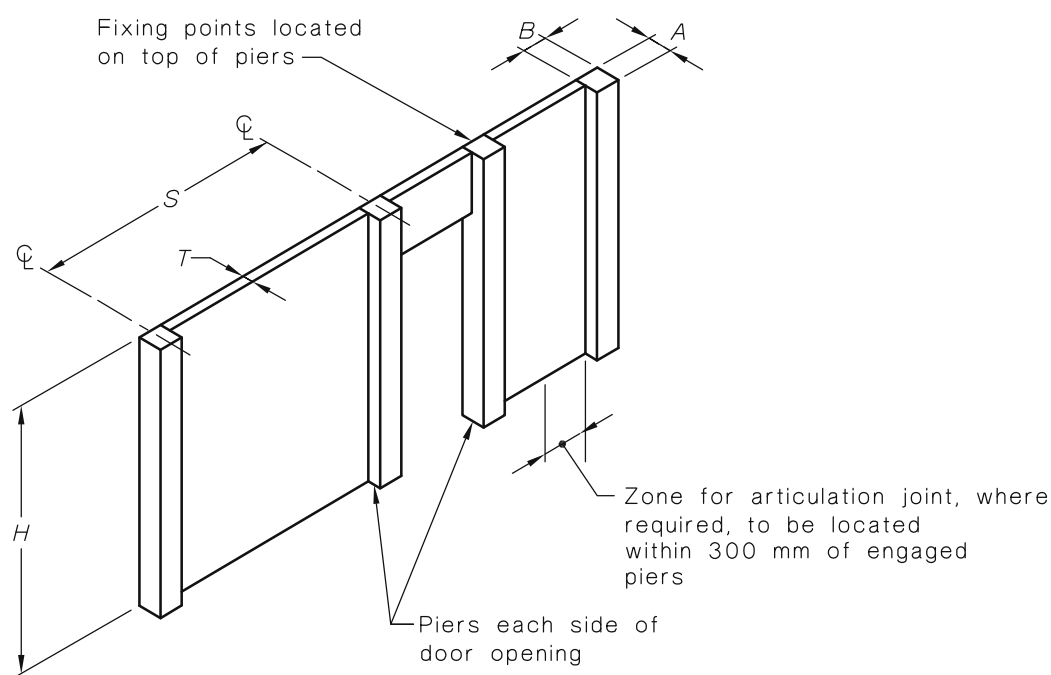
ENGAGED PIERS IN EXTERNAL SINGLE-LEAF WALLS
